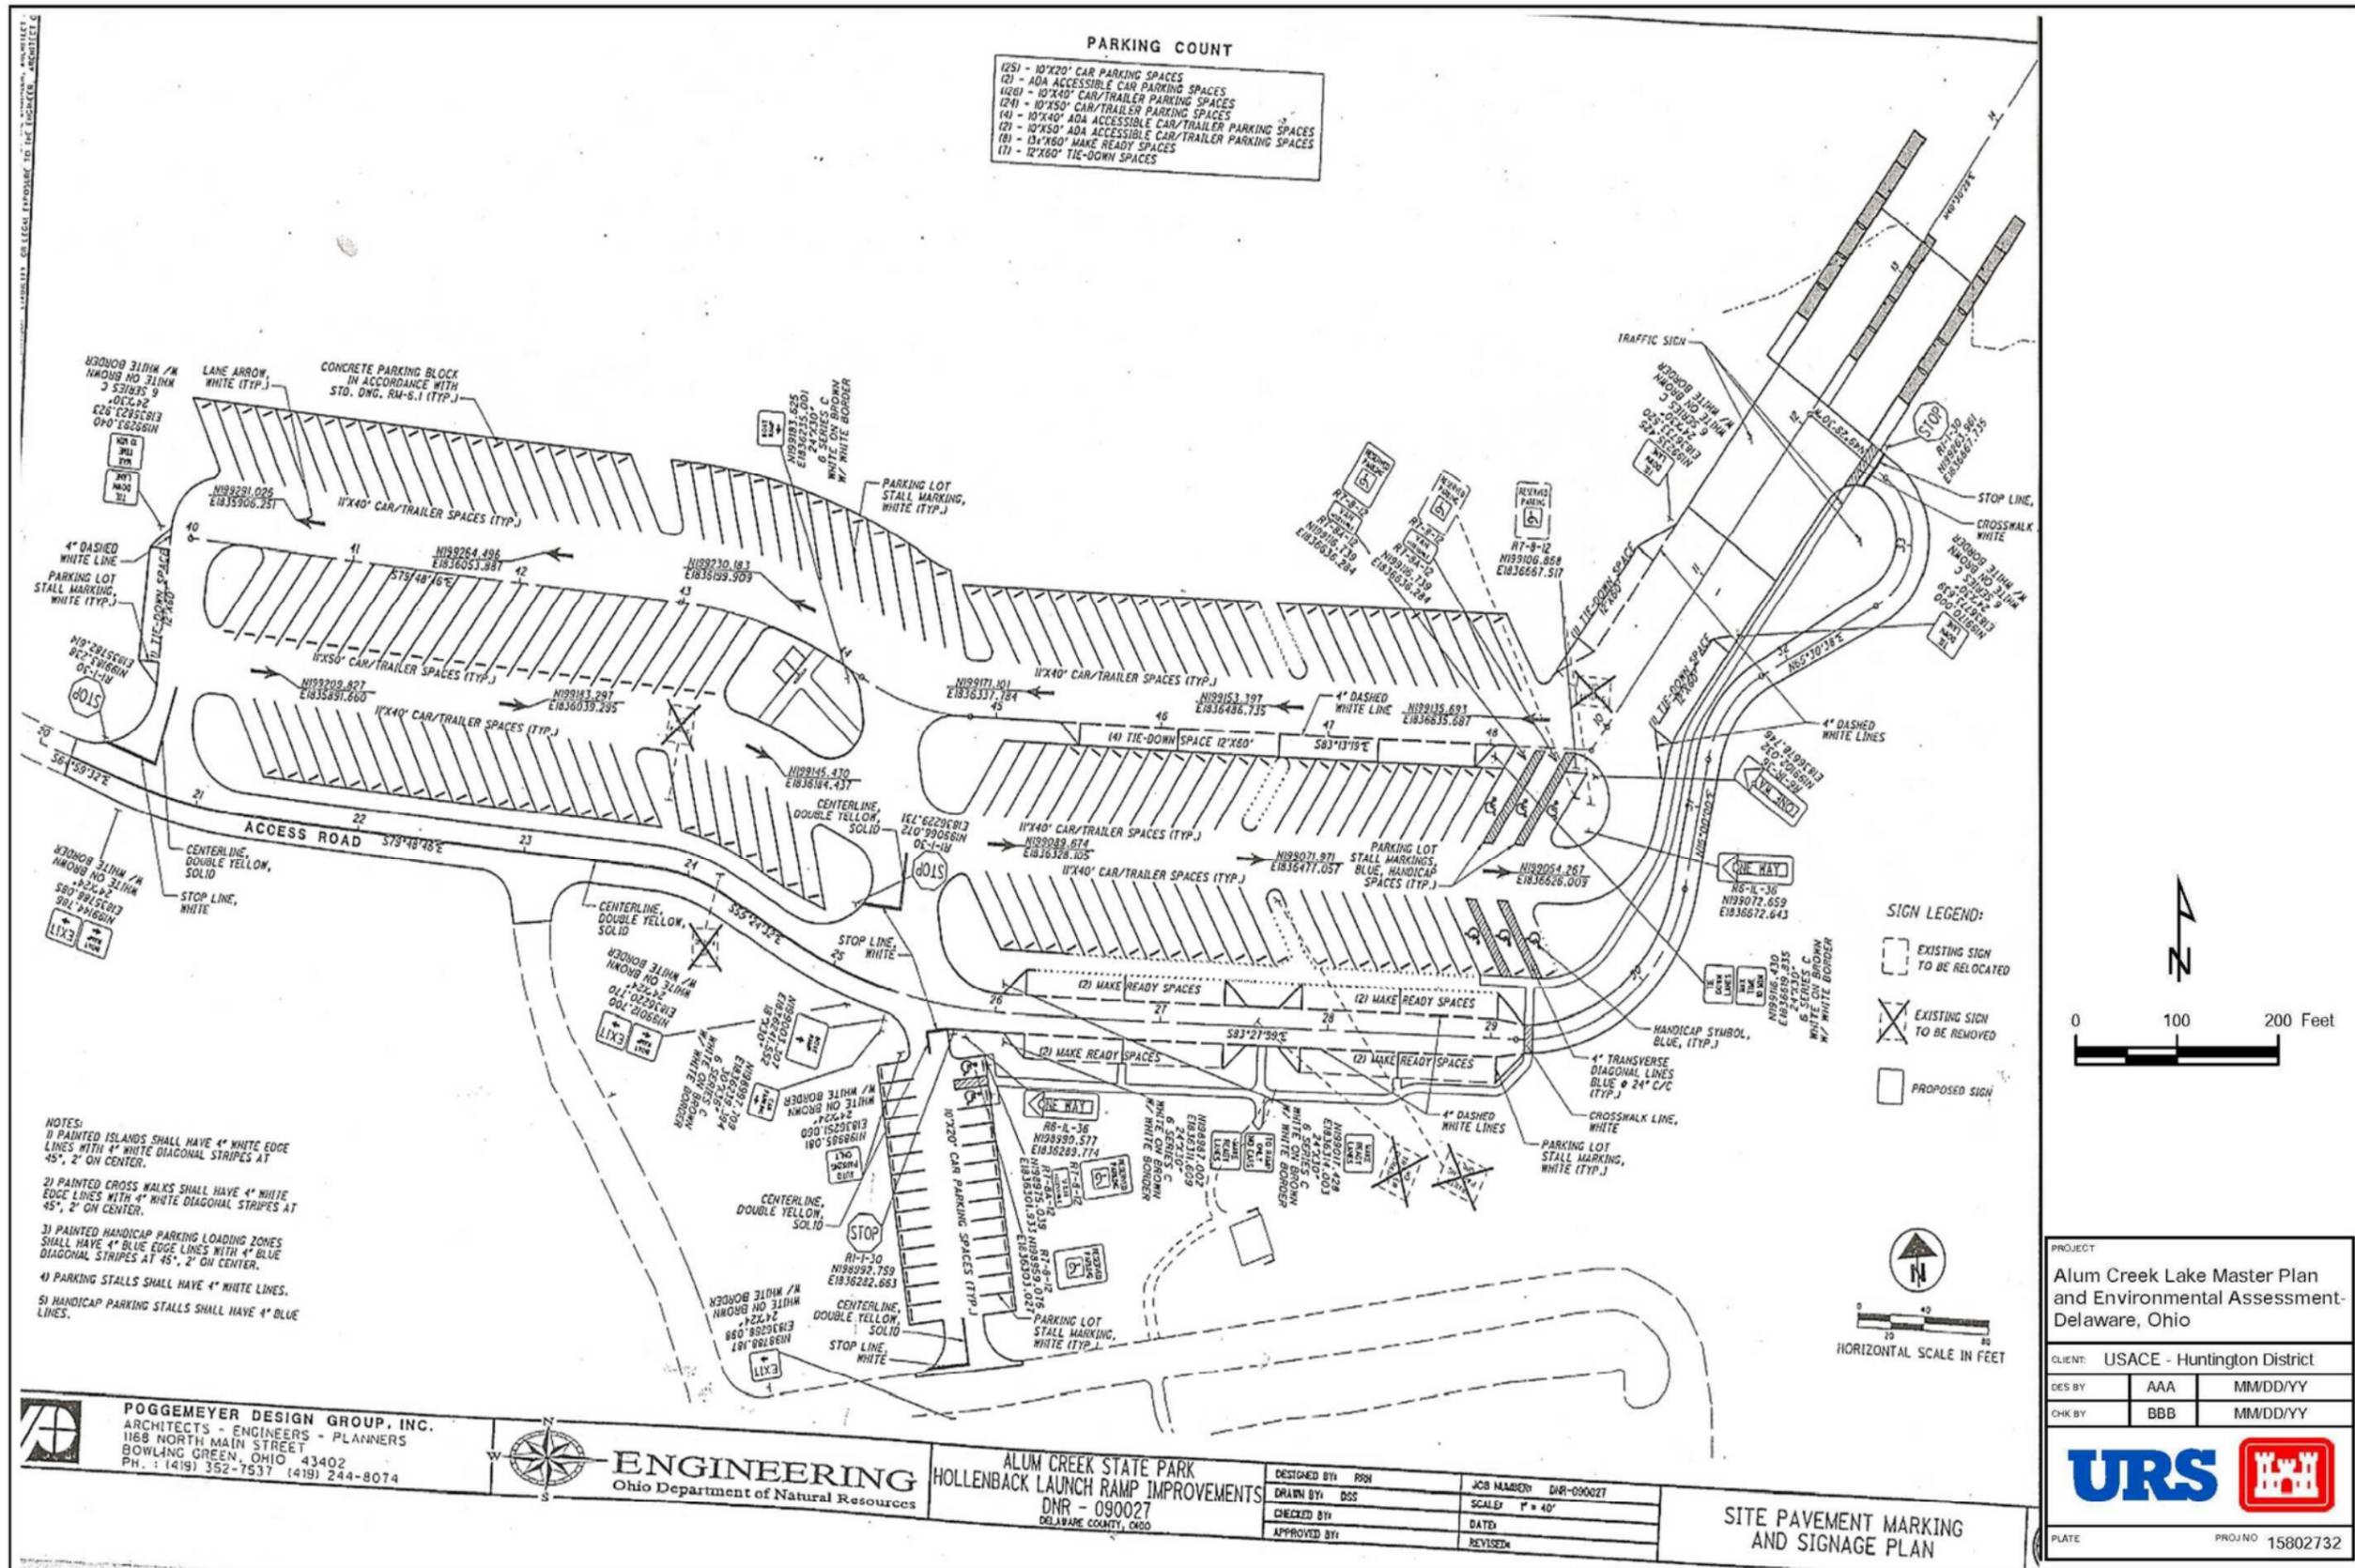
Alum Creek Lake Hollenback Boat Ramp and Parking Improvements, Site Plan
